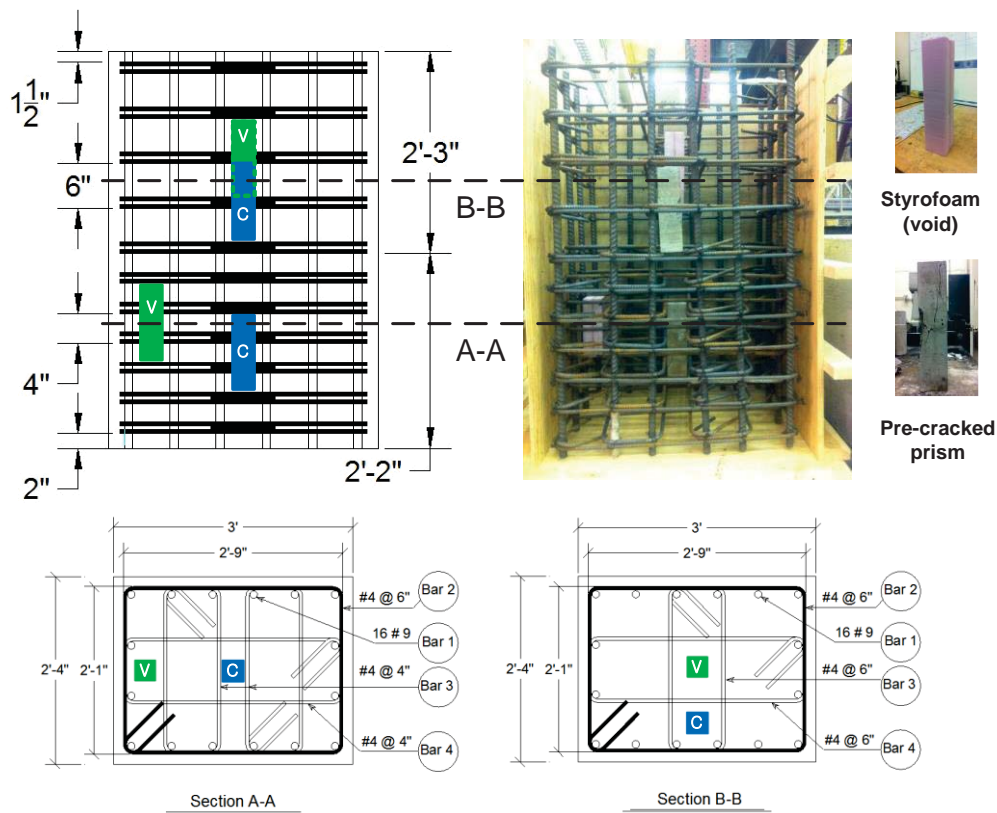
Embedded void column design plan, Design in imperial units, 1 in. = 25.4 mm. Reinforcement size US #4, metric #13 bar (V: foam voids, C: pre-cracked concrete).
